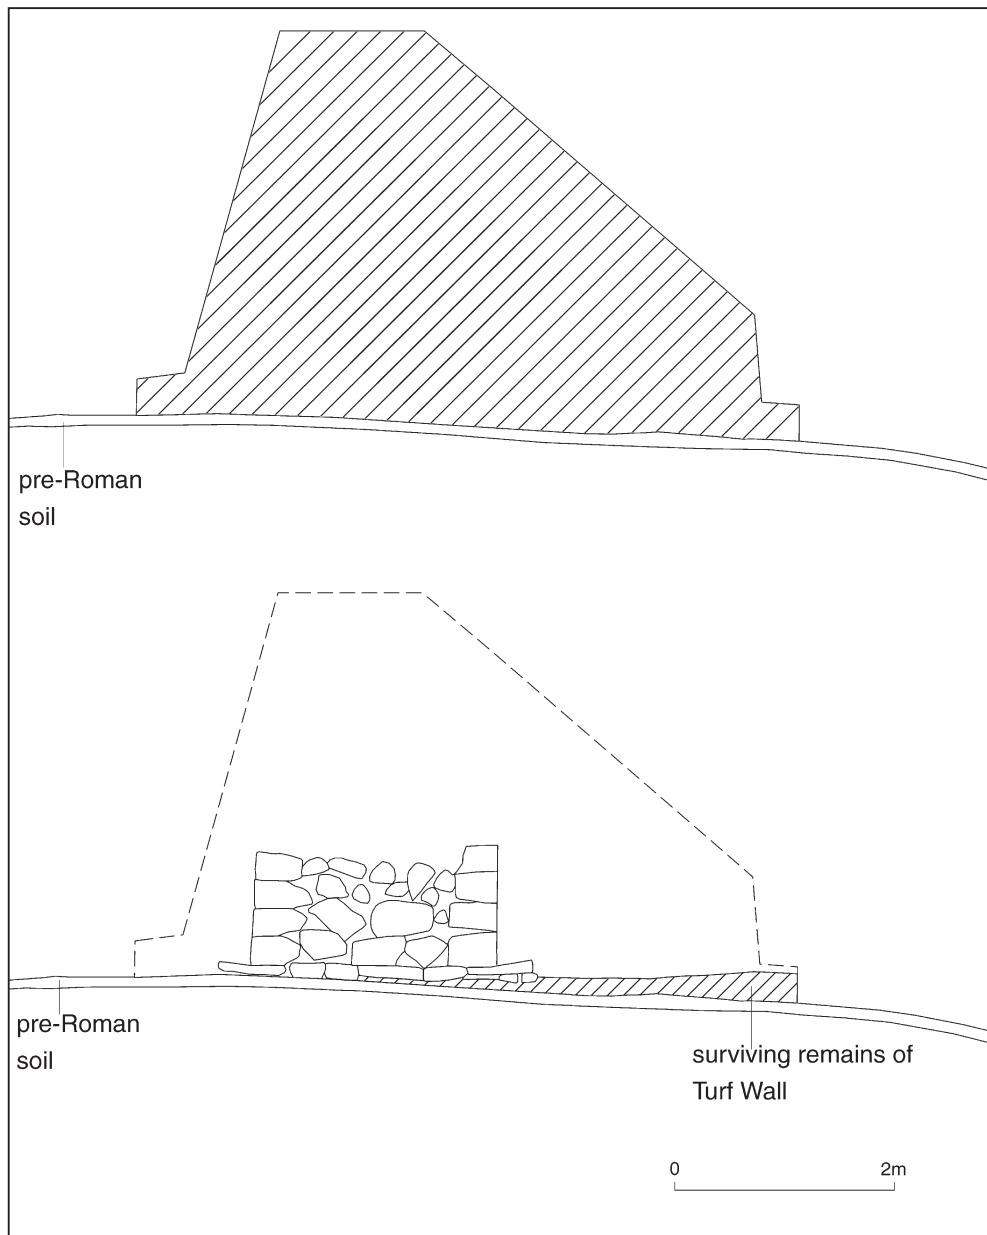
Diagram illustrating removal of Turf Wall to create level platform for Stone Wall.
